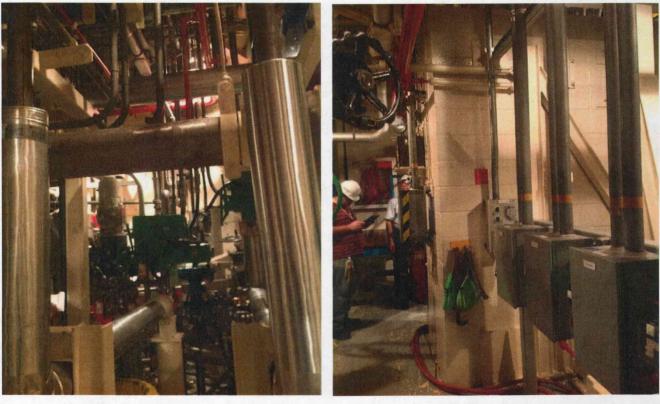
General View of Room 236 Photo 2 Masonry Wall
